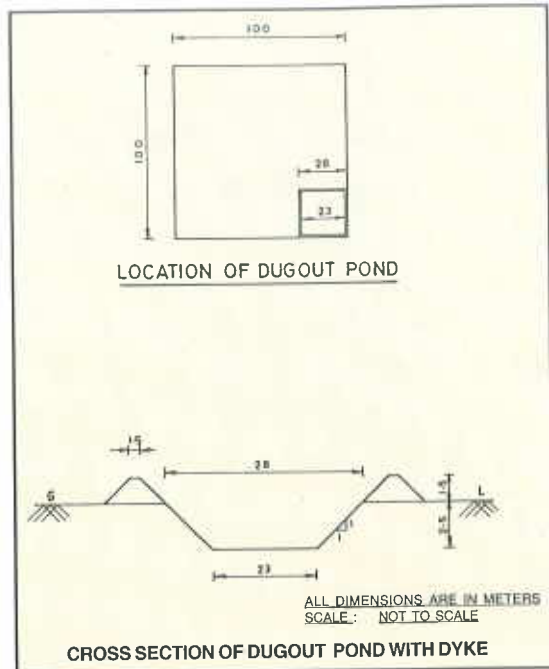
Location and cross section of dugout pond suitable for 1 ha land
